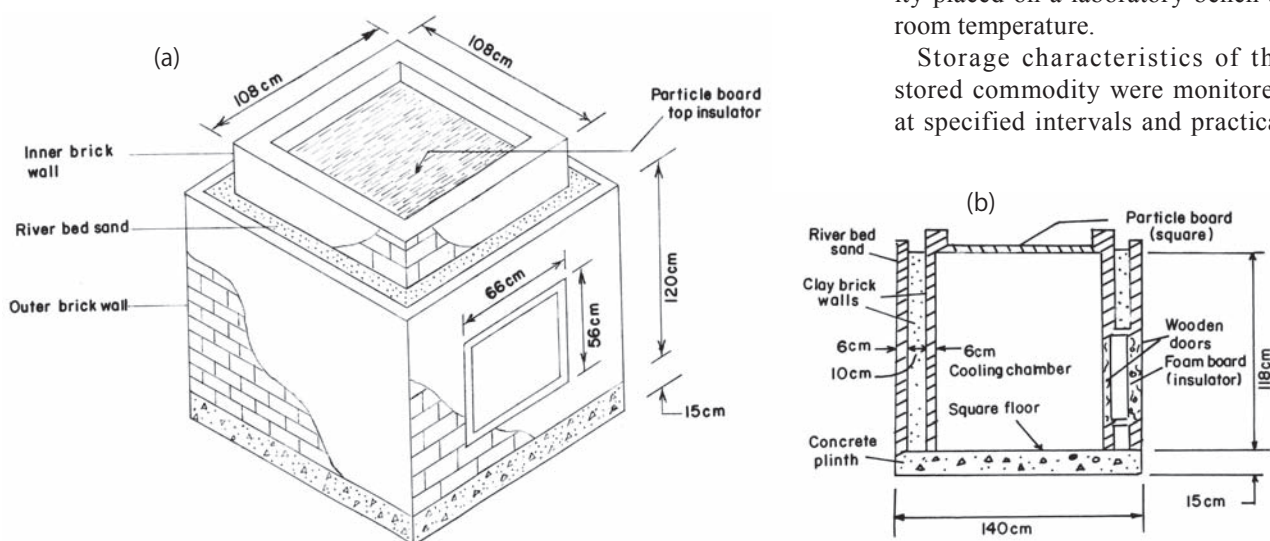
The brick walled cooler, (a) Isometric view and (b) Sectional view
